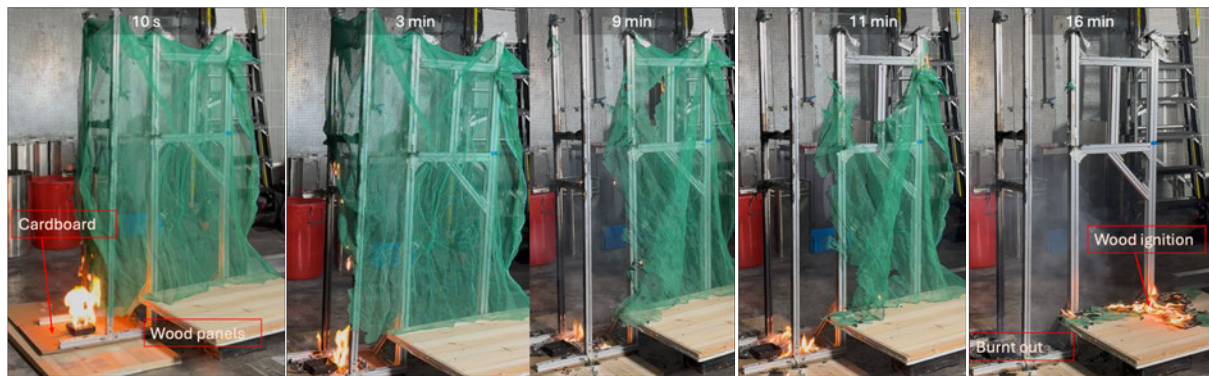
Joint burning test on non-FR safety net and cardboard, and wood panels (Test D1)
